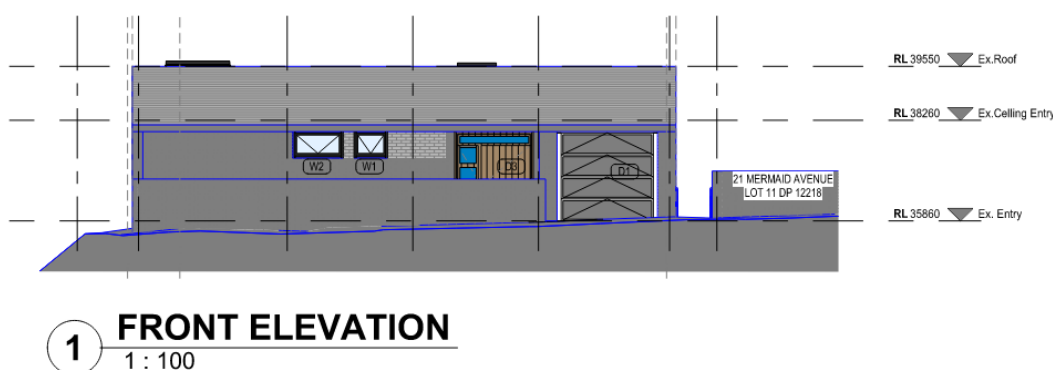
Front elevation of proposed development on Mermaid Avenue.
